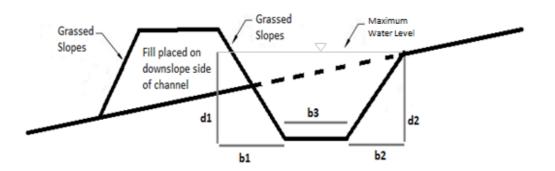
CROSS SECTION THROUGH A TYPICAL STORMWATER DIVERSION CHANNEL (SLR, SEPTEMBER 2016)
